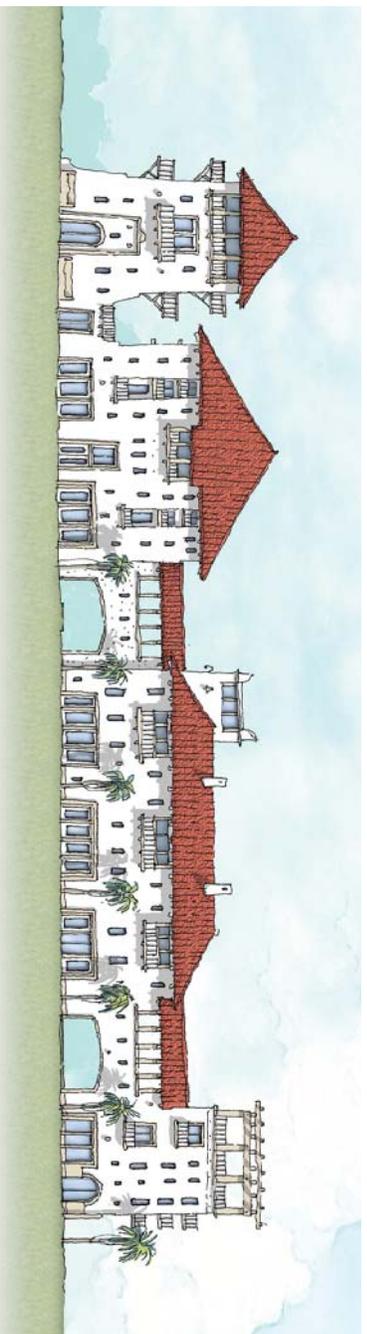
Conceptual Elevation of Proposed Mixed-Use Building
